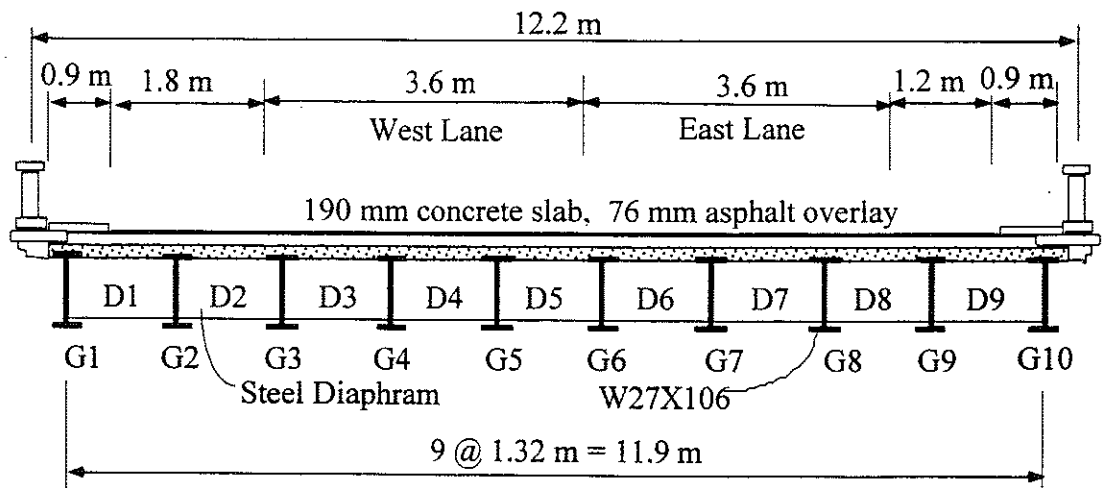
Cross-Section of Bridge M156/SC in Morenci.
